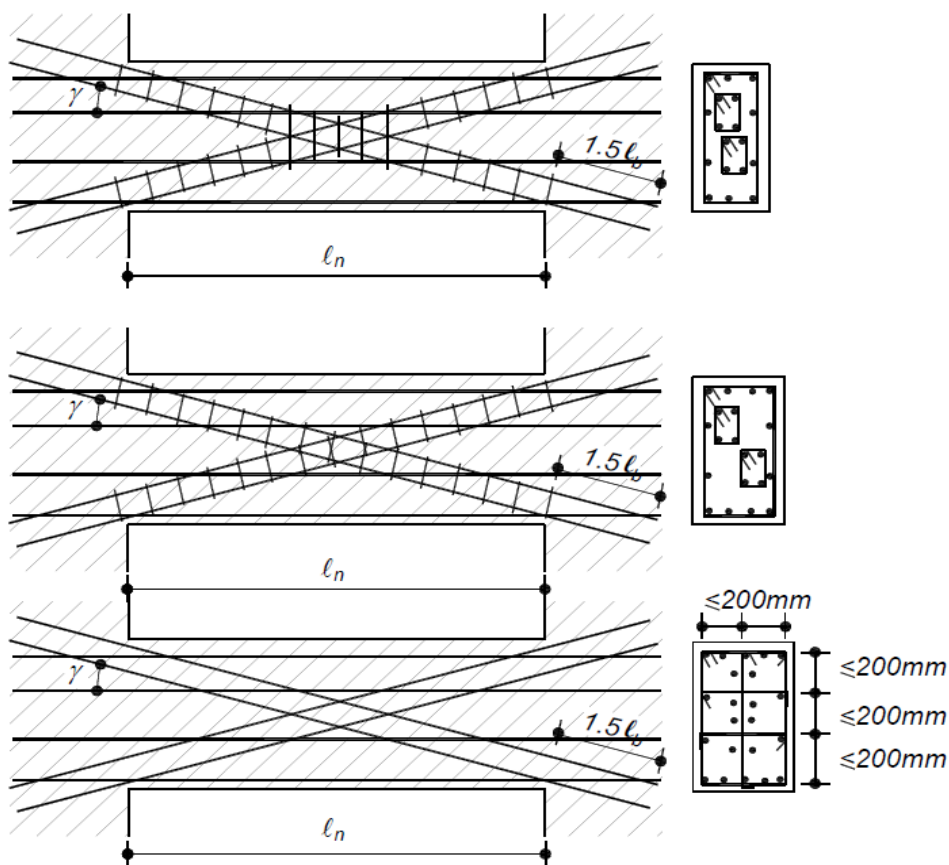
Examples of coupling beam reinforcement in coupled wall [3].
